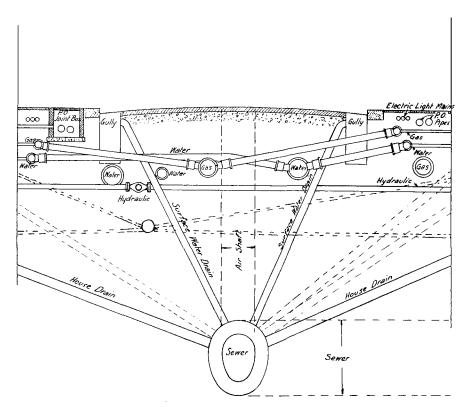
SECTION SHOWING PLANT UNDER WOOD STREET TO SEWER LEVEL.
